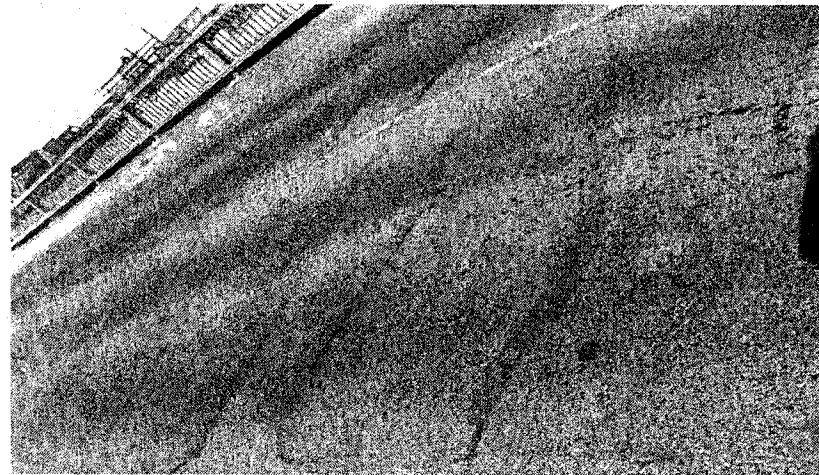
Cracks in the asphalt pavement, before rehabilitation
